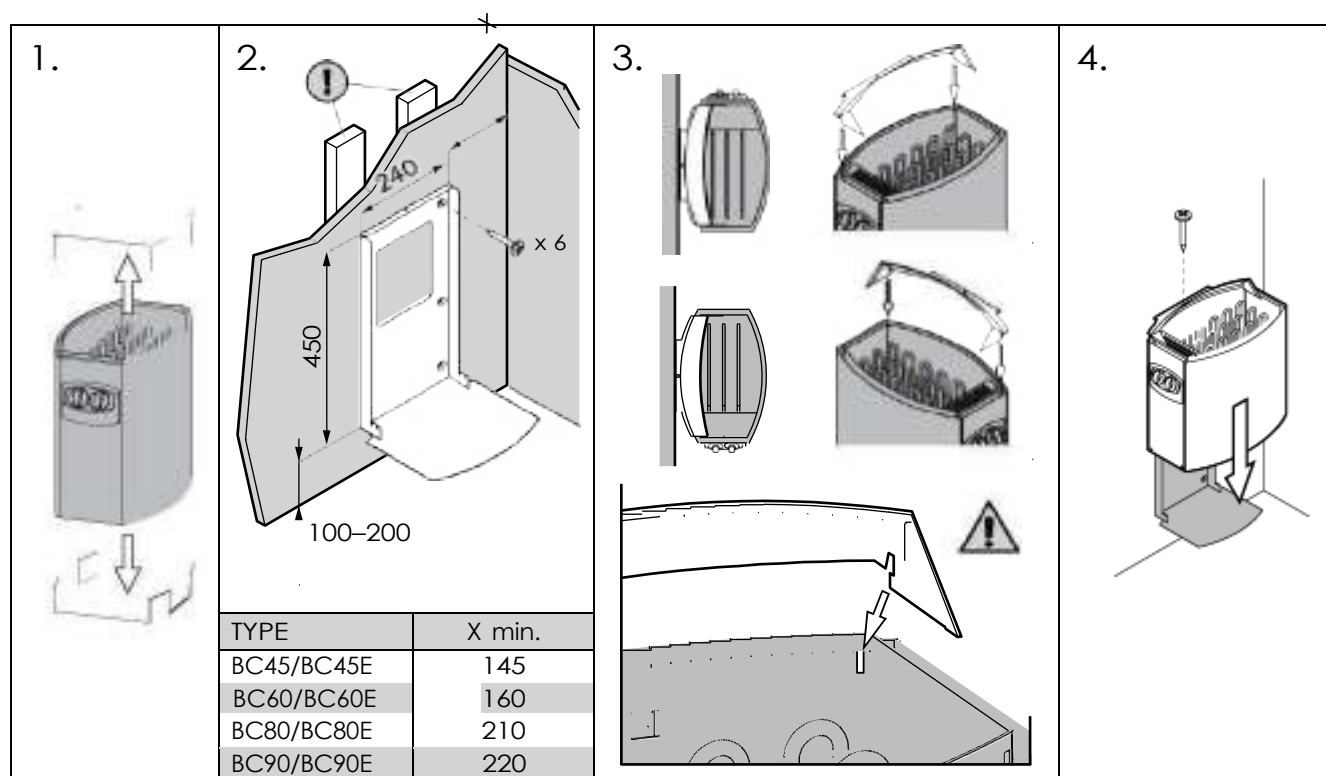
Fastening the heater on a wall (all dimensions in millimeters)
